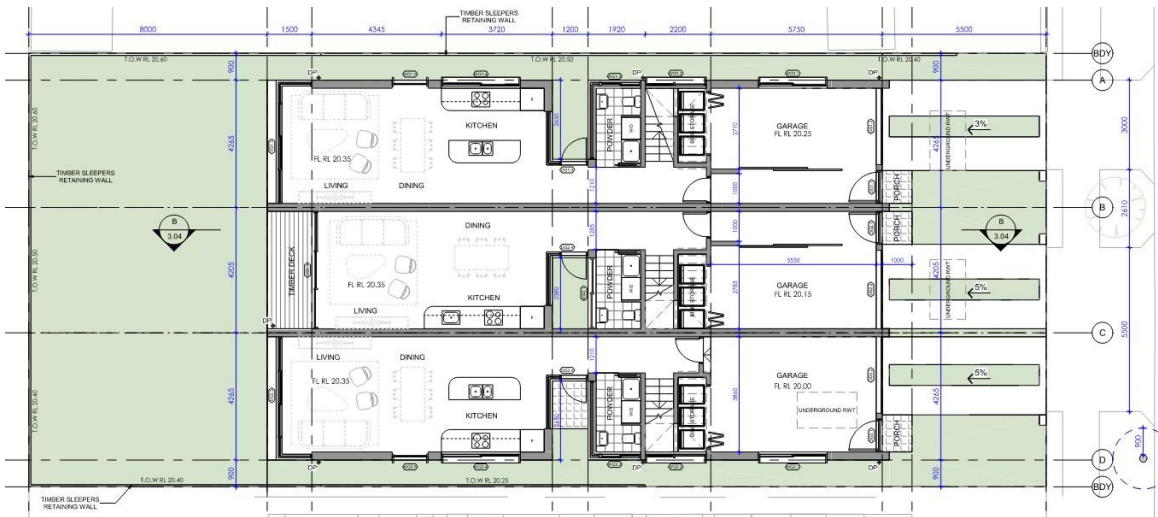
Proposed ground floor plan (Source: Bryan Long Group)
